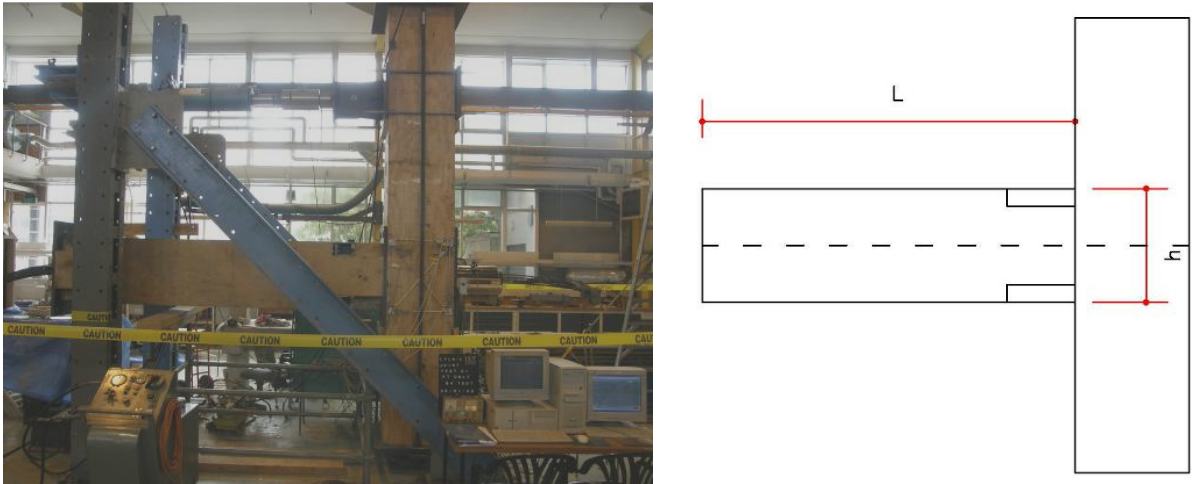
View of PT-only beam-column joint a) test specimen b) with dimensions
